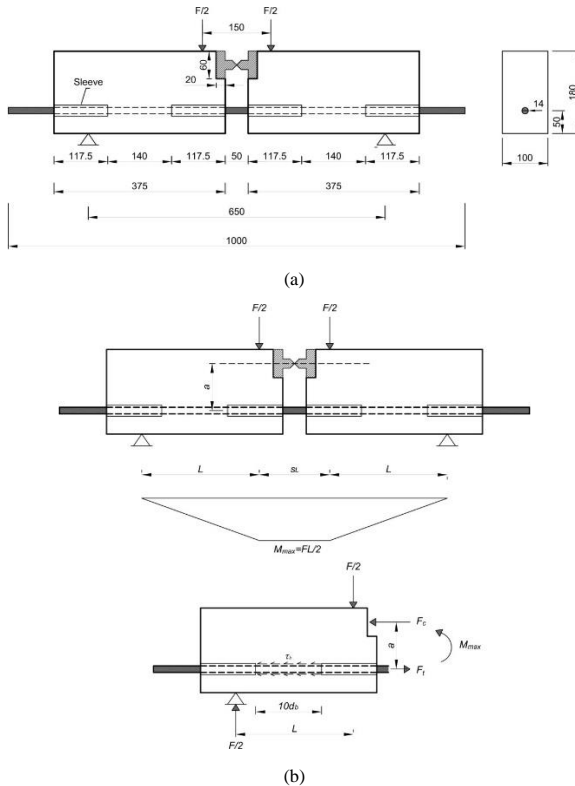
(a) Beam test specimen detail for $d_b=14$ mm (b) load transfer mechanism [31]
